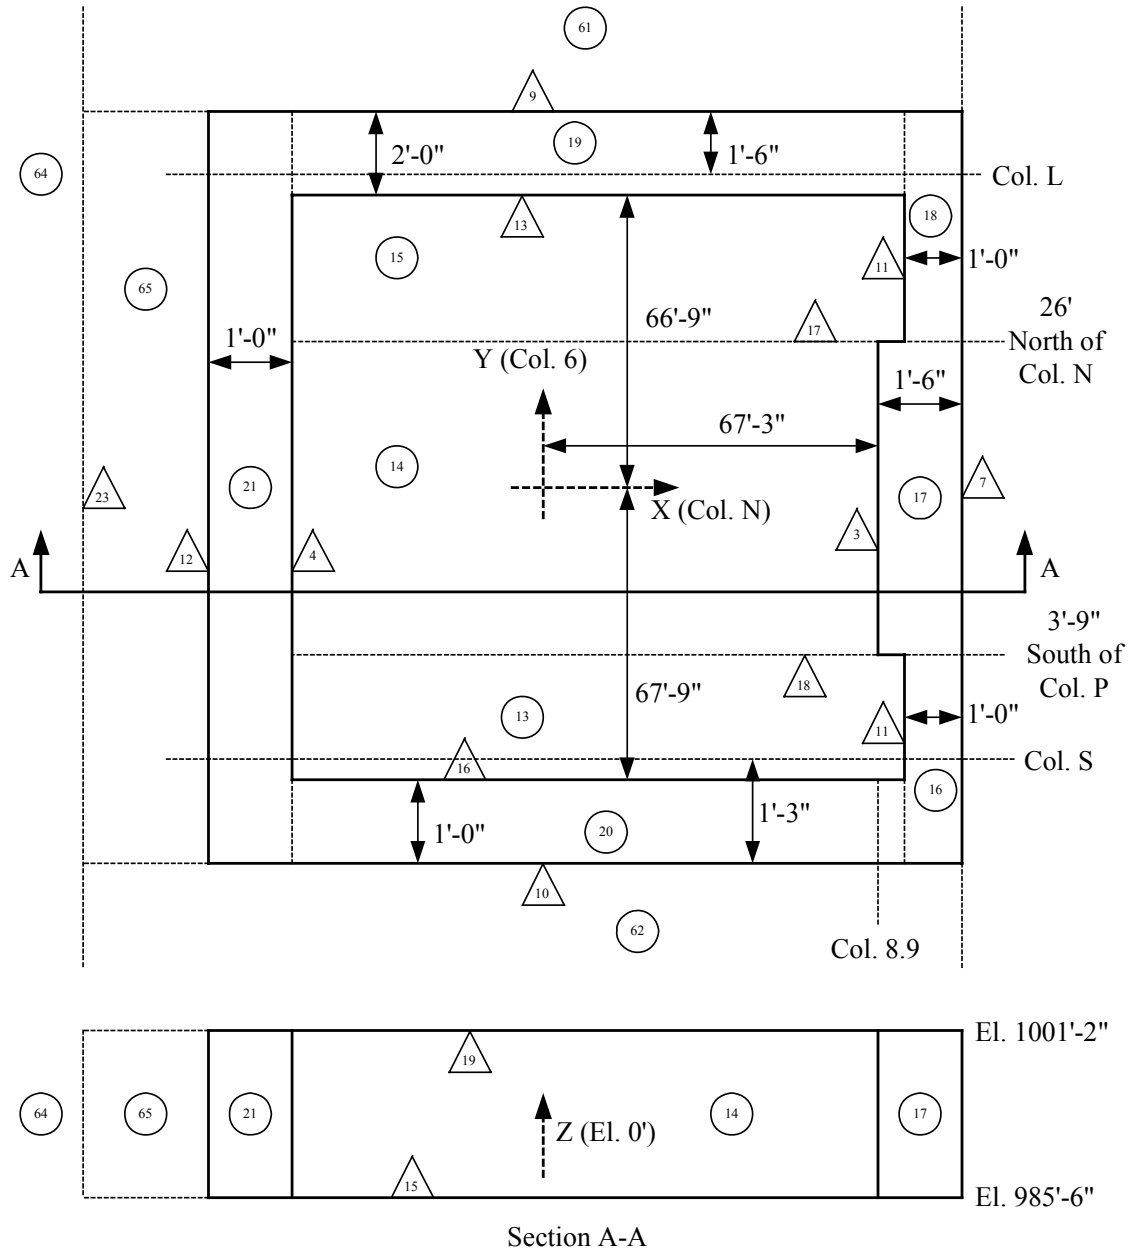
Geometry Model for the Reactor Building, Elevation 985'-6" (Not to Scale)
